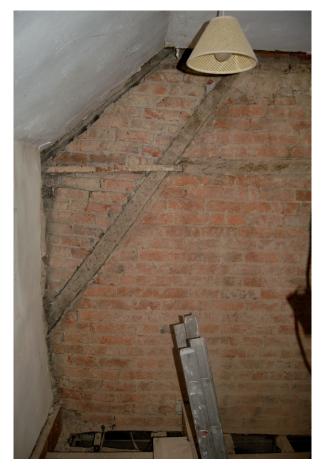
Dividing wall between cottages; first floor, west side (No 20) looking east
